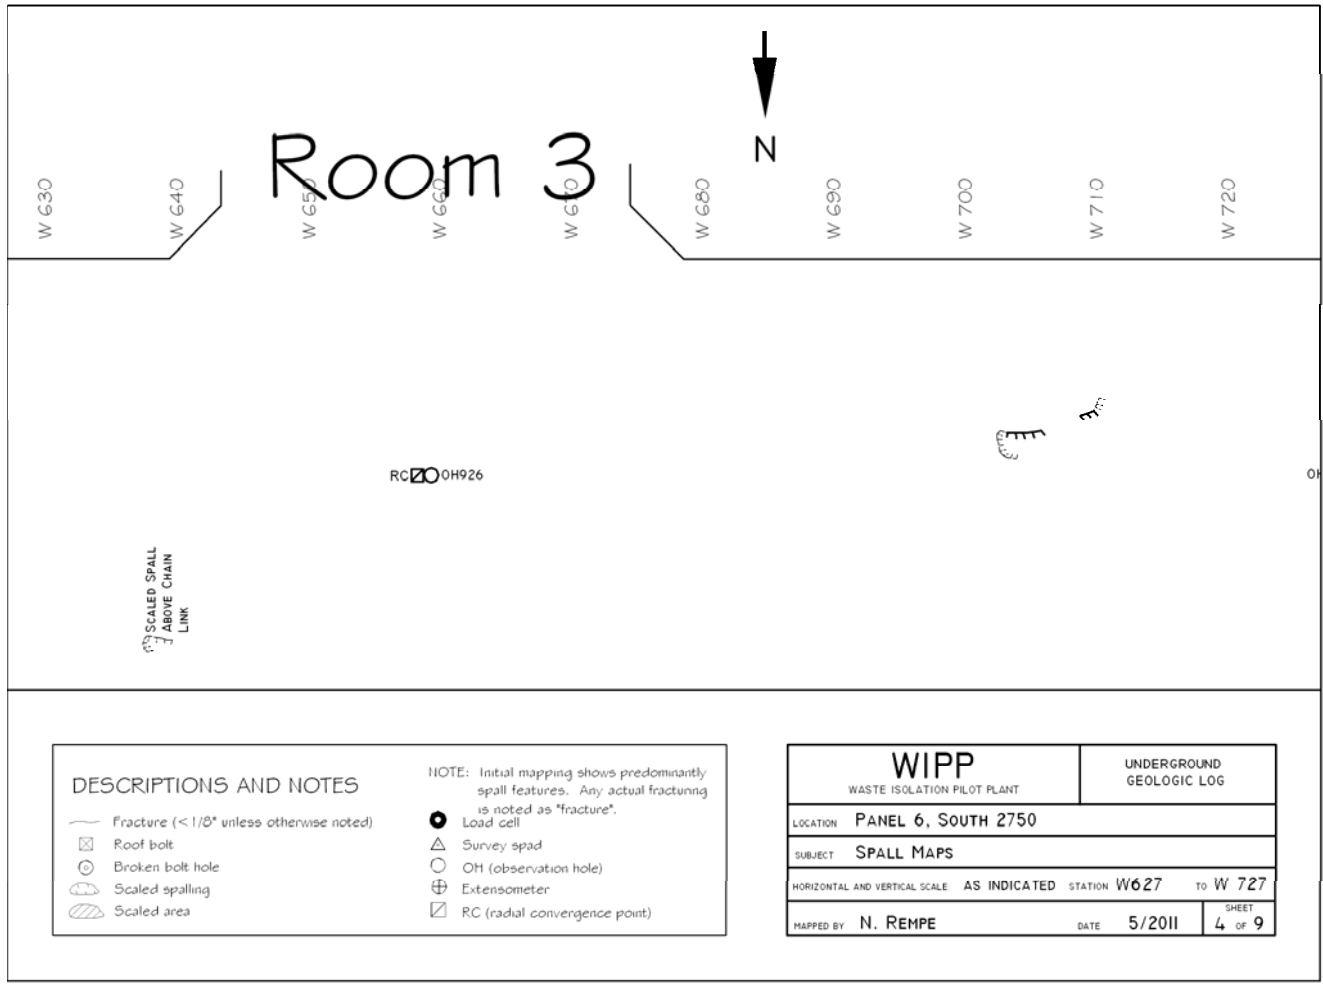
Panel 6 S2750, W390-W1210 Roof Fractures (Sheet 4 of 9)
